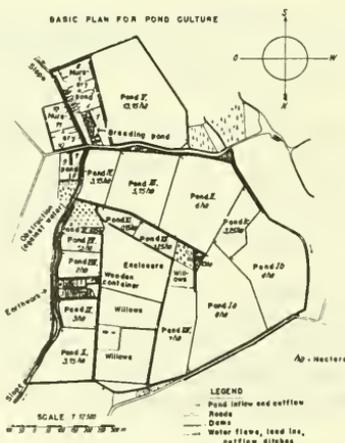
Pondfishery Reckahn. Ground Plan of a North German Carp and Tench Pond Industry. Total area 75 hectares. Example of a standardly arranged larger stock-growing fishery: Spawning and brood ponds are situated at the water inflow, good reservoir constructions (compare also Fig. 59), separate coverage and drainage facilities of individual ponds.
